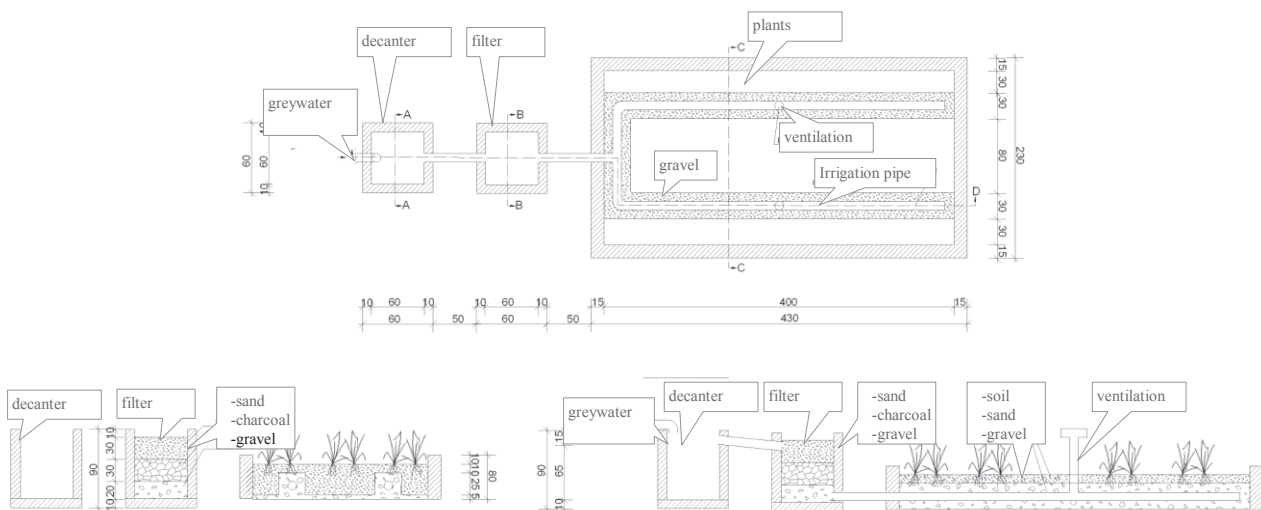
Plan view and cross sections of the greywater garden (source: OtterWasser, 2003)
